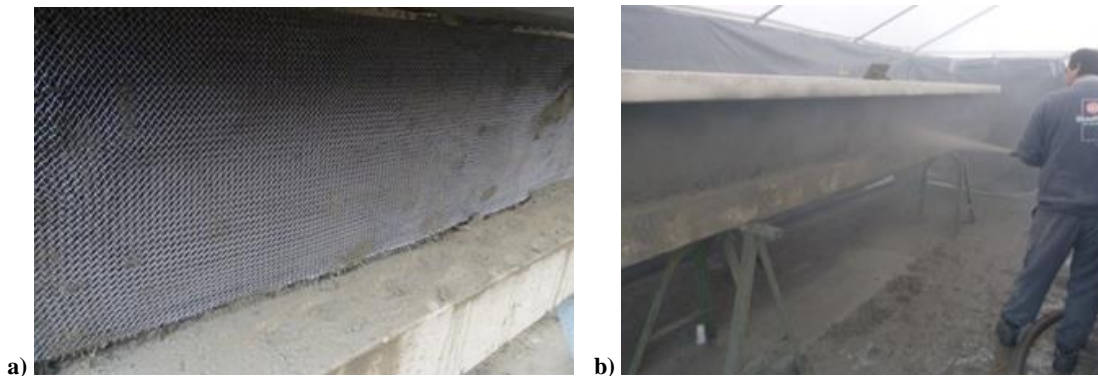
a) Textile reinforcement installed; b) Shotcrete application
